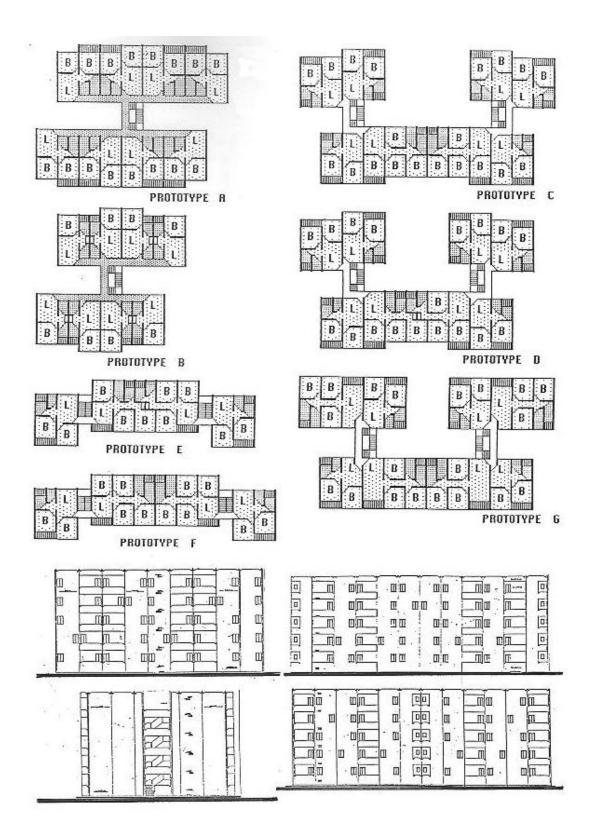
Typical recent Walk-ups' plans and elevations; low cost housing prototypes, Egypt, (7,15).
